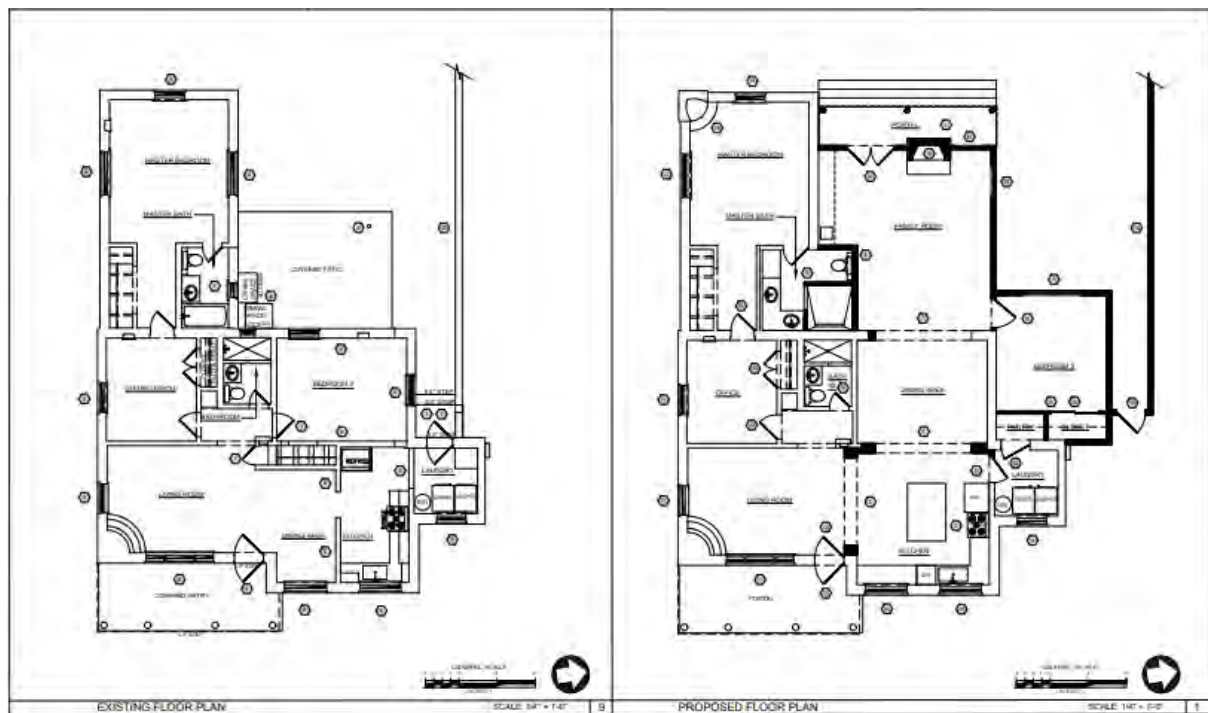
Existing and Proposed Floor Plan for the main residential structure.
